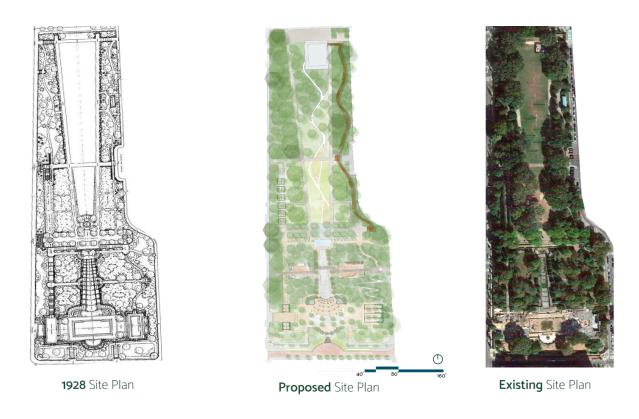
Final Site Plan Compared to Historic and Existing Site Plan
